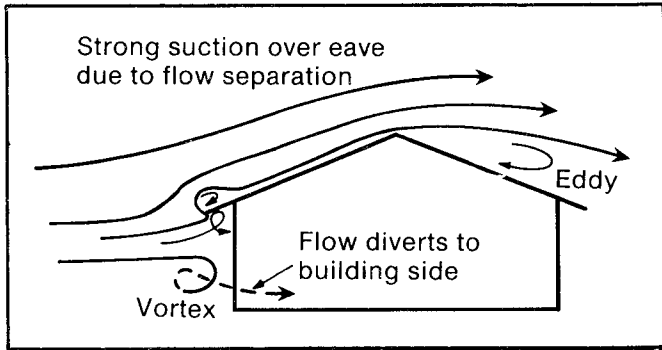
Airflow Past a Building (Side Elevation) With a 5 in 12 Roof Pitch (Flow Pattern Will be Similar for any Roof Pitch Greater Than 3 in 12)
